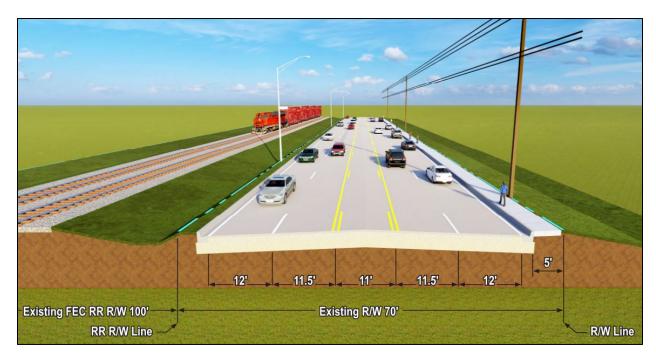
Existing Typical Section 1 – SR 5/US 1
